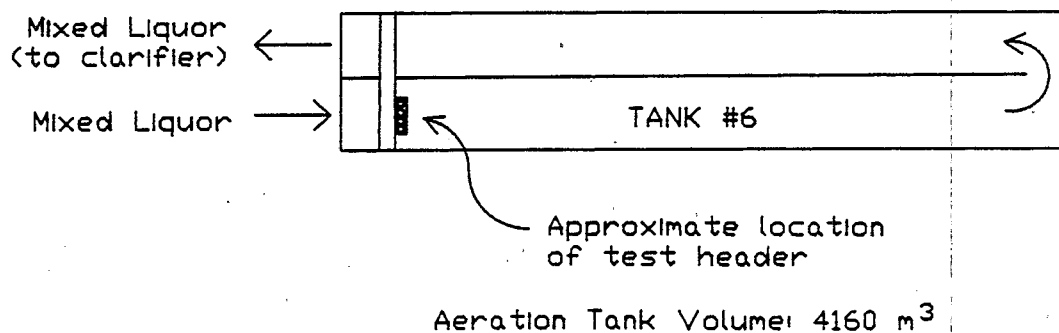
Jones Island West Plant plan sketch of Tank 6.
